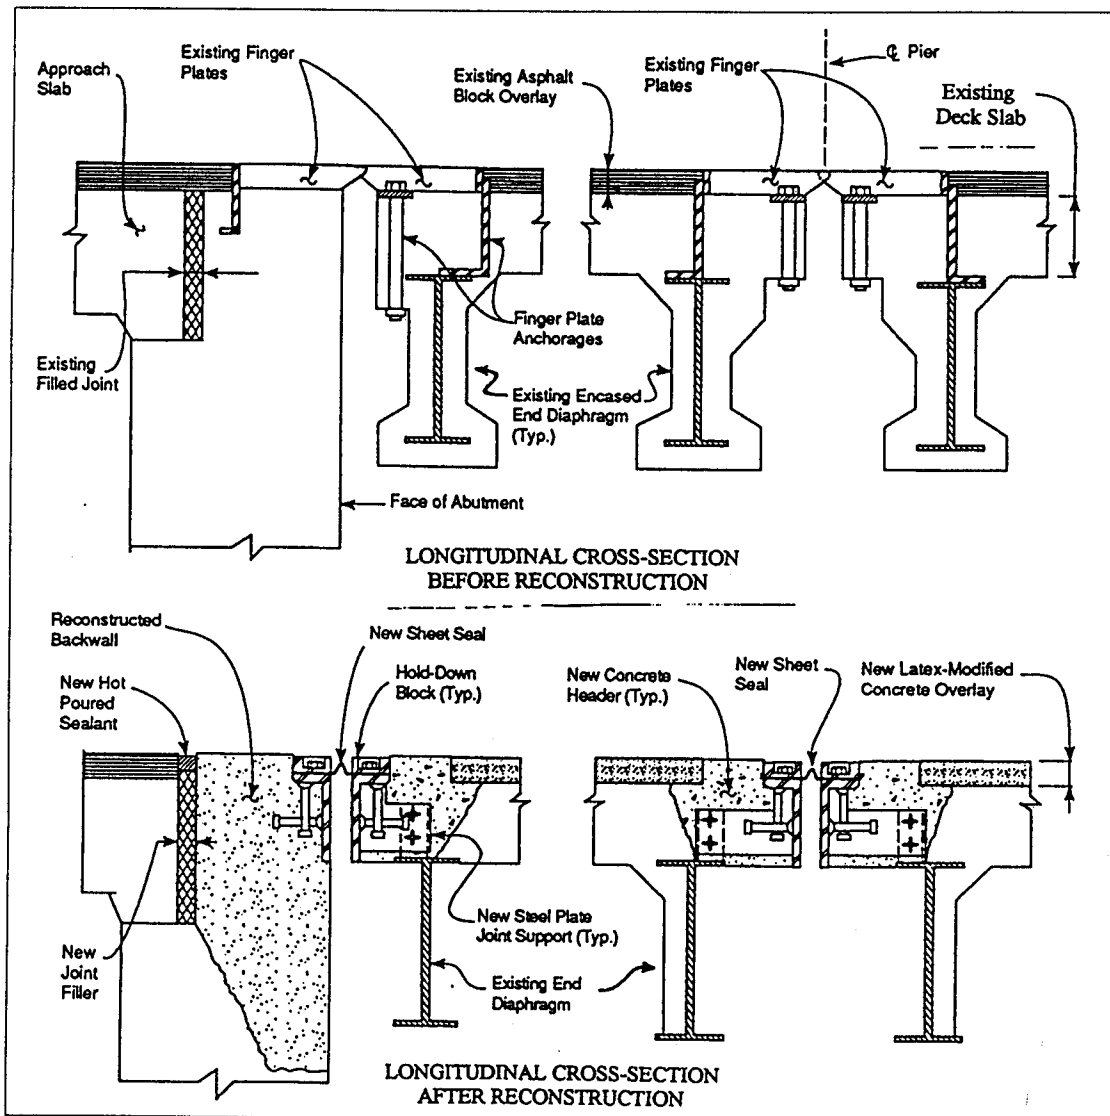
Replacement of finger plate joints by sheet seals on route 71 Bridge
